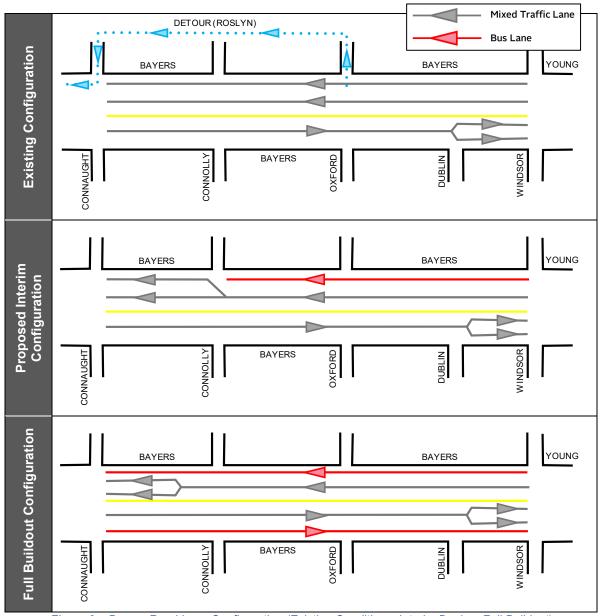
Bayers Road Lane Configuration (Existing Conditions, Interim Design, Full Buildout)
